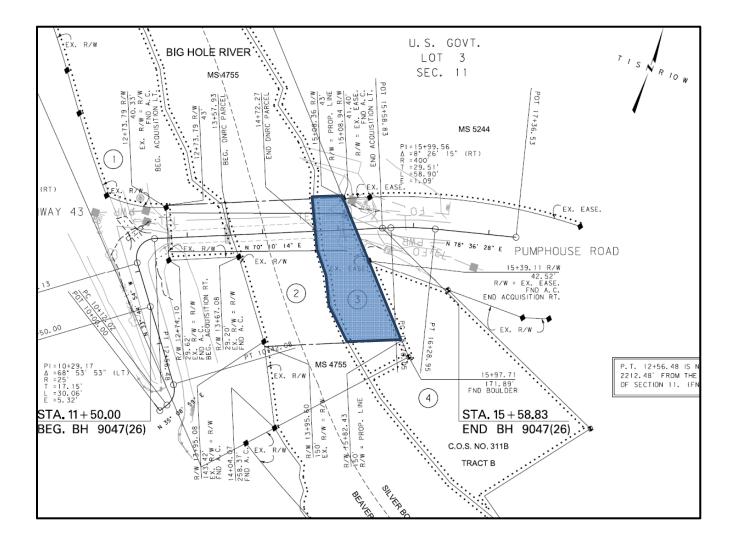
MDT Plan Sheet showing FWP property to be conveyed
